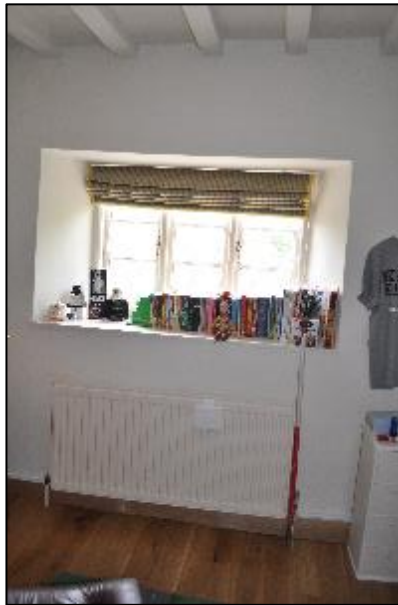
The Triple Casement Window in the eastern wall of bedroom F8
